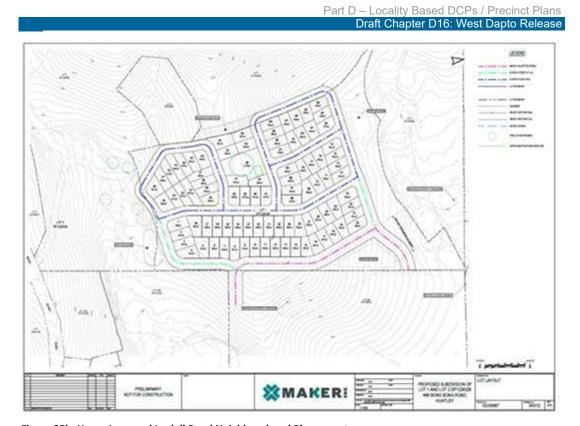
Hayes Lane and Iredell Road Neighbourhood Plan – western area
